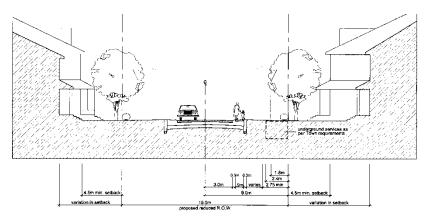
Proposed Rolled Curb Street Section. Note: This sketch is for illustrative purposes, and does not replace Town standards.
